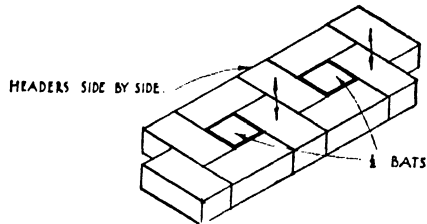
ONE AND A HALF BRICK WALL IN FLEMISH BOND
